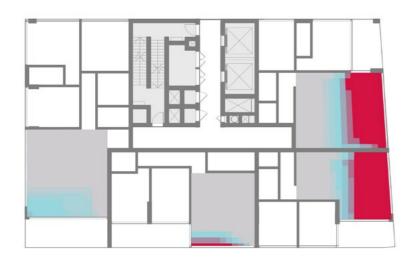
Building 2 Solar Access Plan 3 SYDNEY OLYMPIC PARK OVER AND ADJAC 3.3.4 Solar access - Building 2 | Detailed solar access analysis concept design
